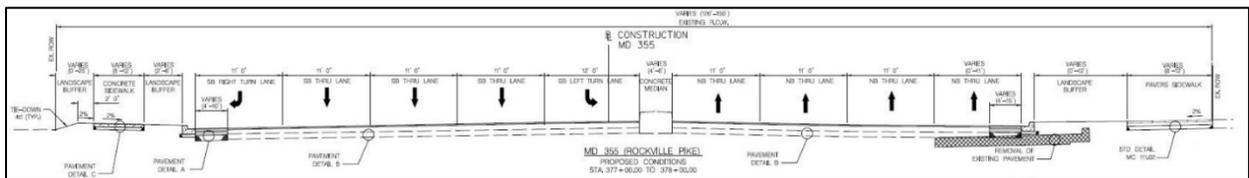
Proposed Phase 2 Typical Cross Section – Rockville Pike North of Old Georgetown Road
